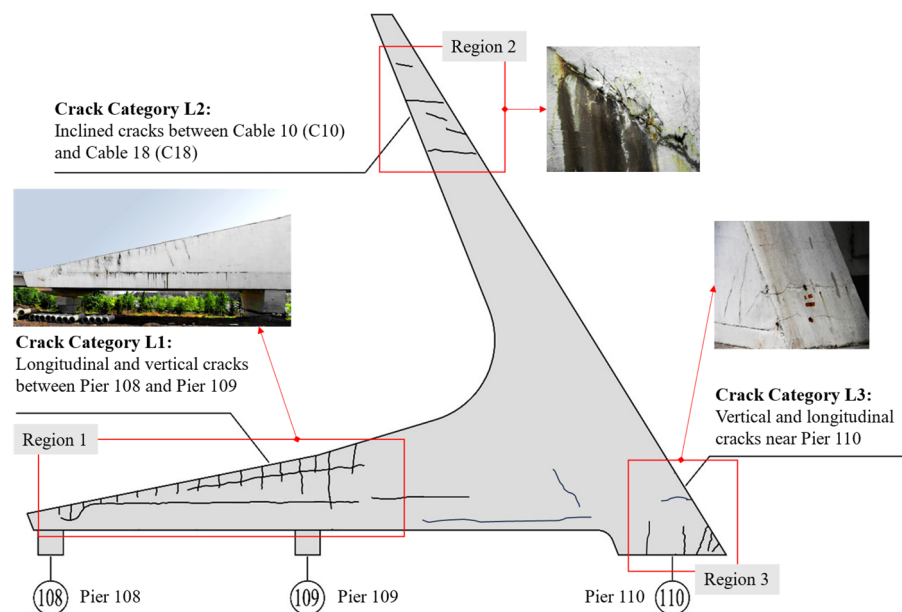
Distribution and detailed photographs of cracks in the pylon.
